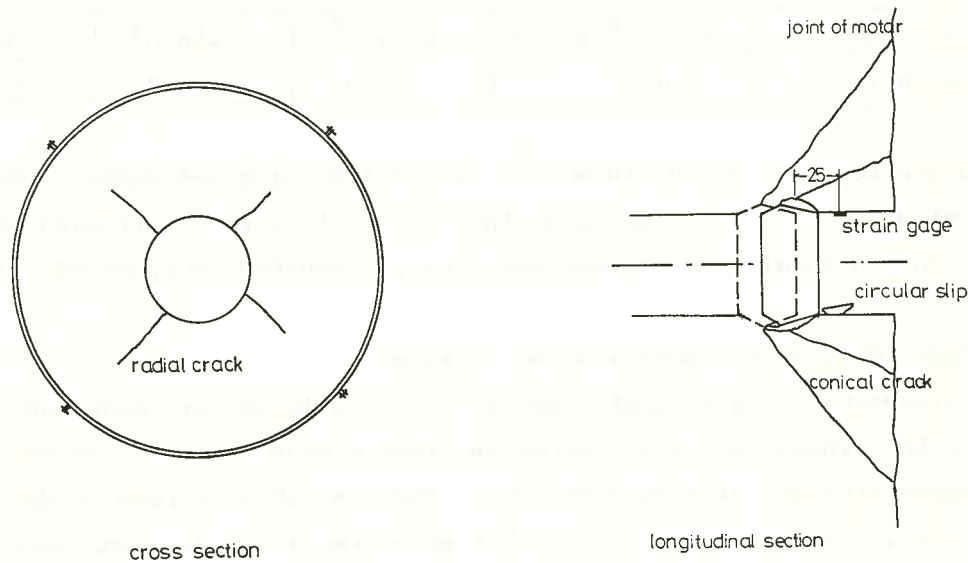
Failure Cracks and Slip Lines in the Weak Rock.
